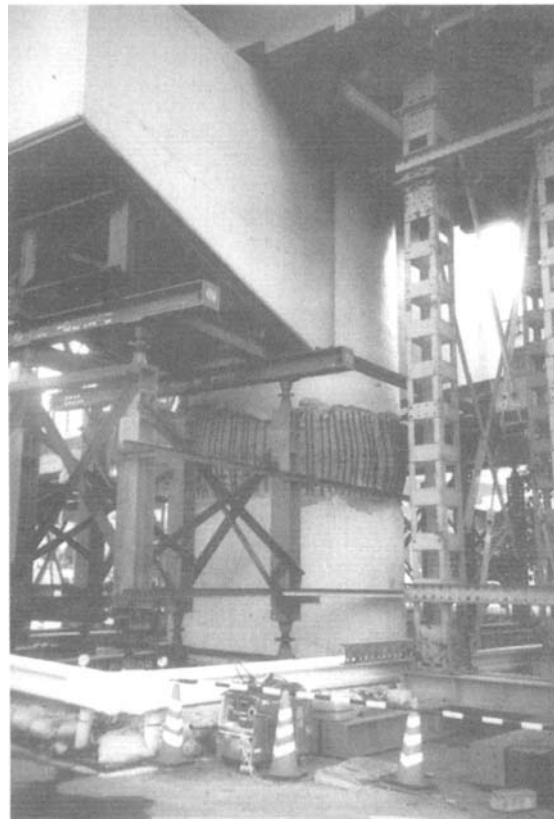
Compressive failure of a pier of Port Island Crossing. Note distress on pier head
